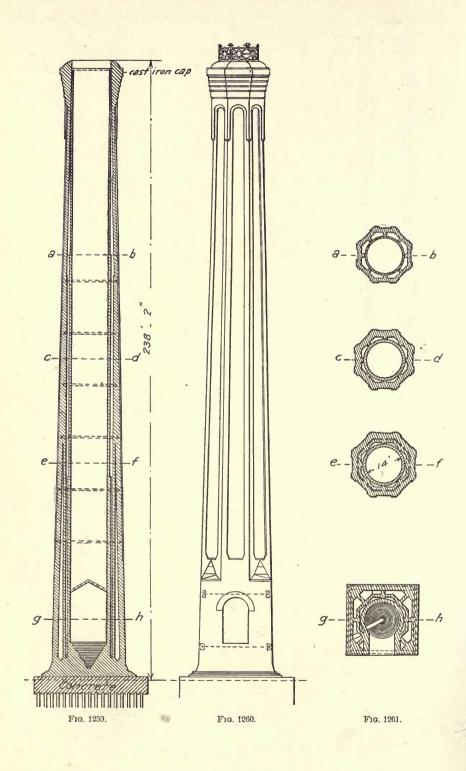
, 1260, and 1261 are sectional elevation, front elevation, and cross-sections of a chimney of large dimensions, built by Mr. Henthorne for the Narragansett Electric Light Works, Providence, R. I.
